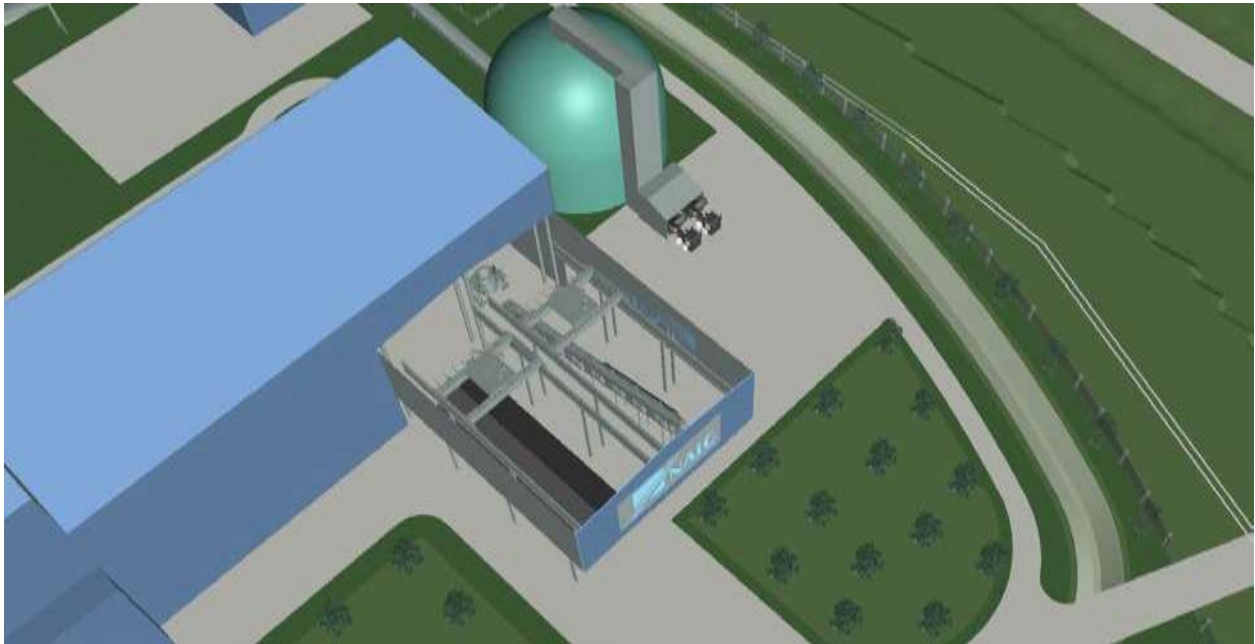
position of the Pig Casting machine and pig Iron storage in the plant
